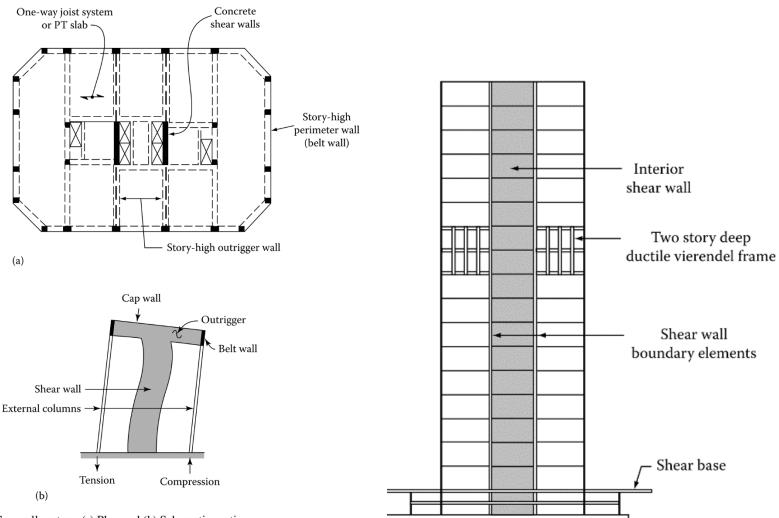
Cap wall system: (a) Plan and (b) Schematic section.
